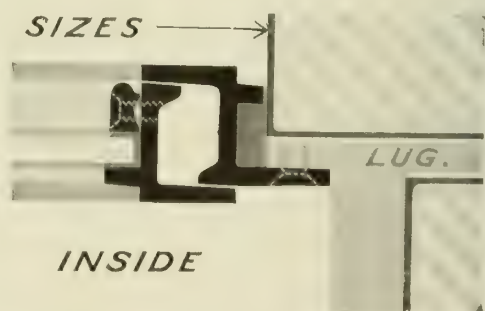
DETAIL SHOWING APPLICATION OF HOPE'S SECTION 22 CASEMENT FOR SETTING INTO REBATED STONE OR WOOD
